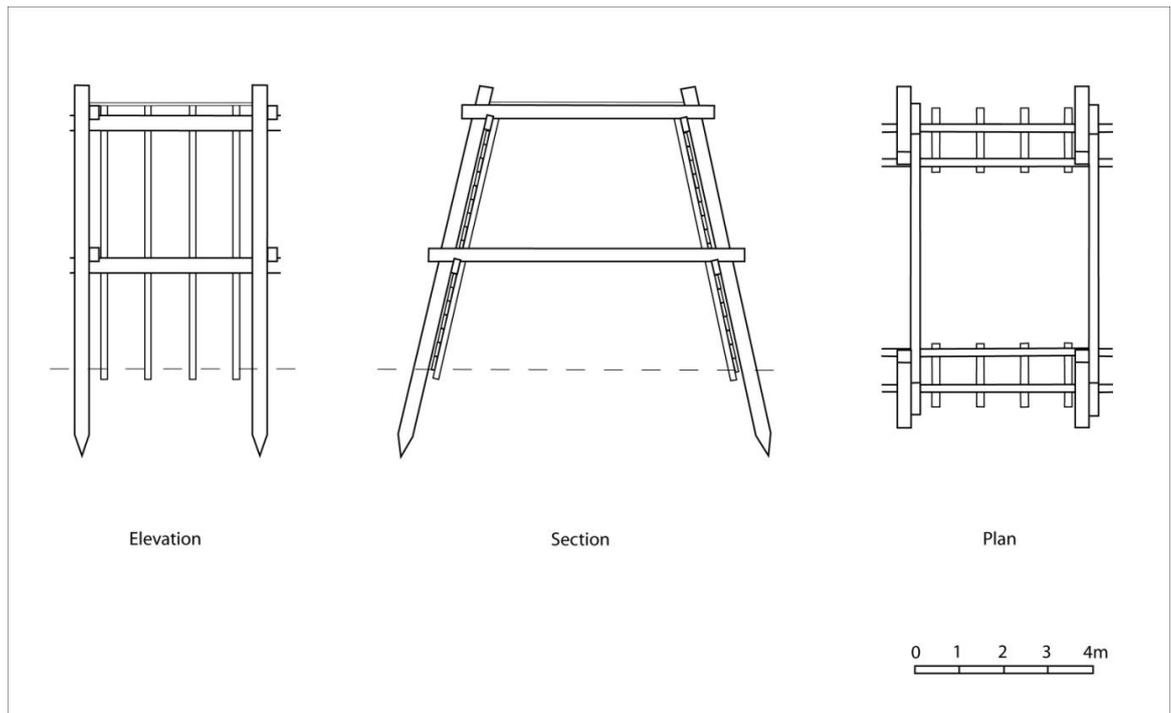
, Reconstruction: elevation, section and plan of a typical bay unit of the post 1717 piers at Bridlington (note that for ease of visual clarity the horizontal timber plank cladding is omitted from the elevation and plan)
